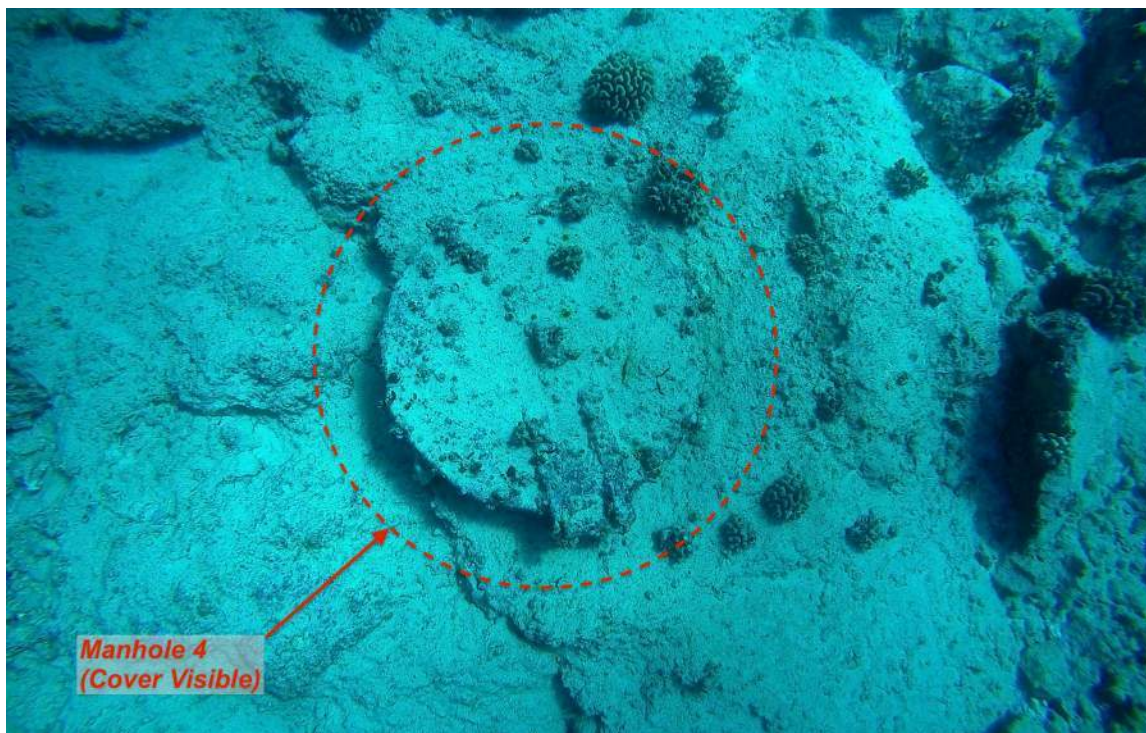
Manhole 4, deepest manhole on the original 36-inch pipeline
